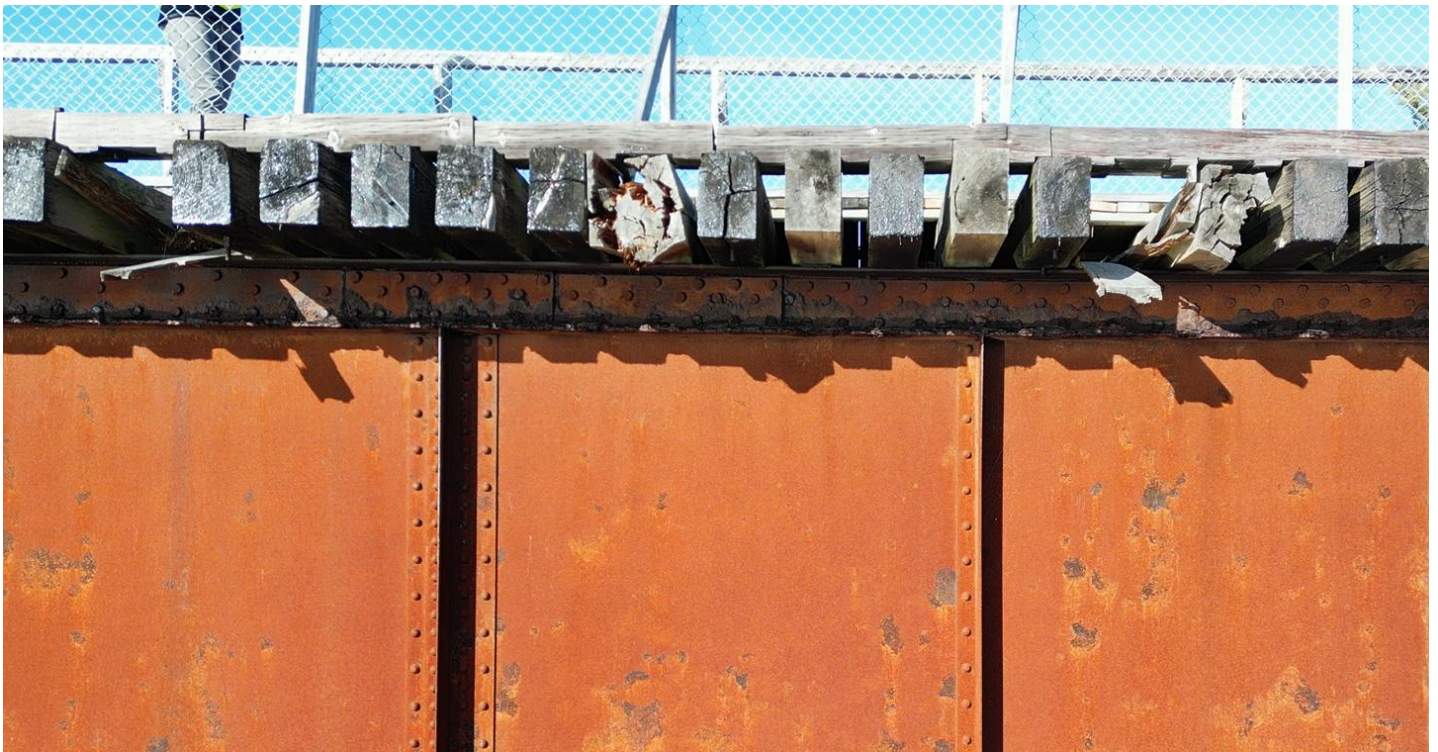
View showing a missing tie, a deteriorated tie, and a severely damaged tie, south side.
